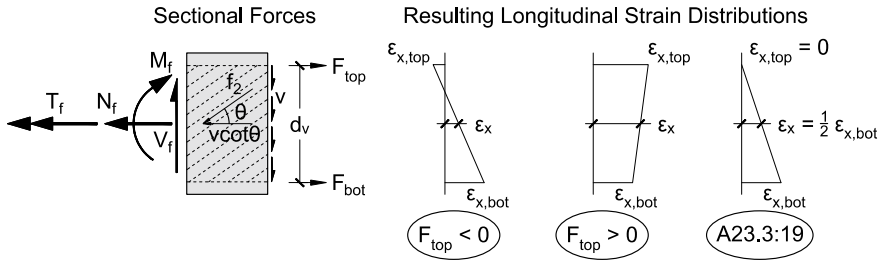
Section of a reinforced concrete member subjected to sectional actions (left) and resulting longitudinal strain distributions (right)
